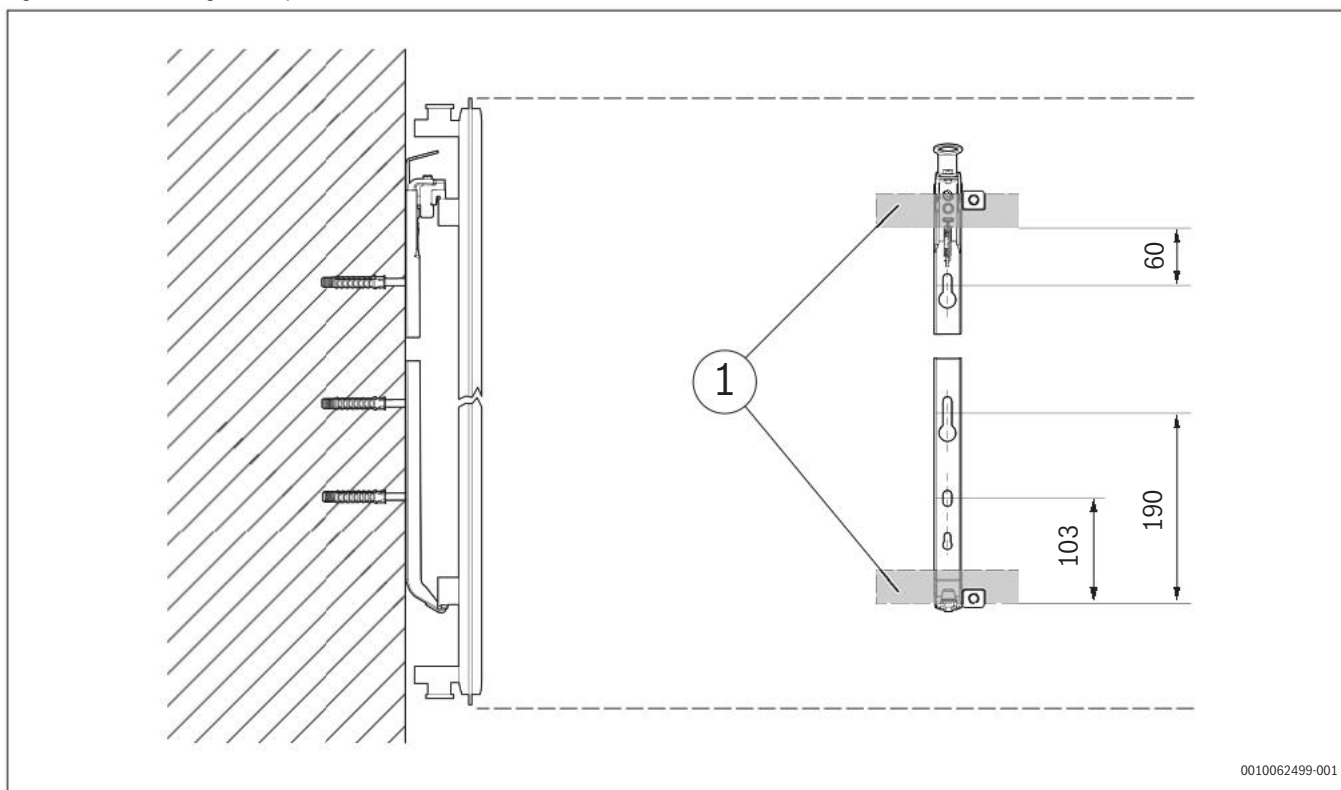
Drill hole dimensions for radiator bracket F8 type 10 for CV
